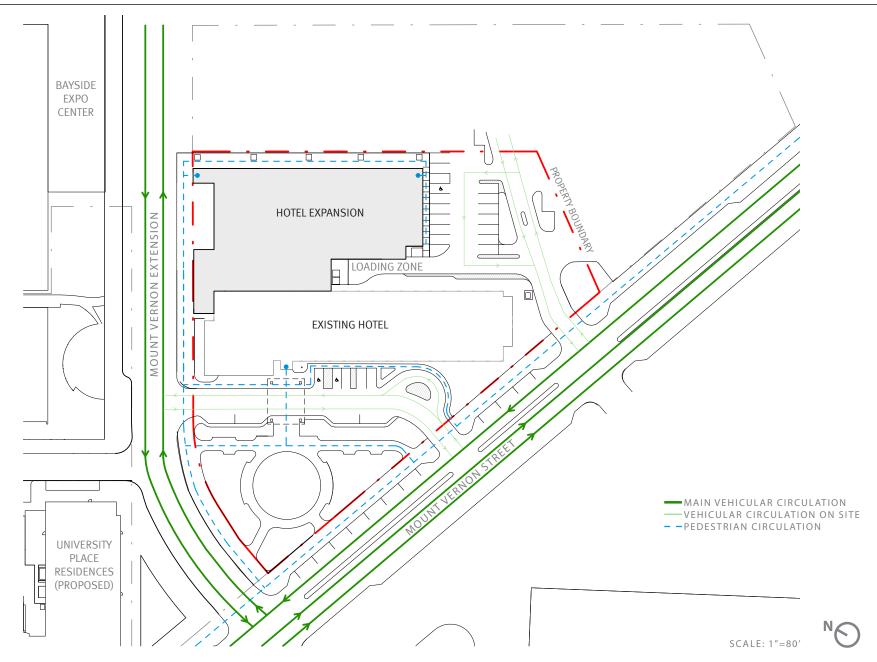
Site Access Plan Source: Arrowstreet, 2014
